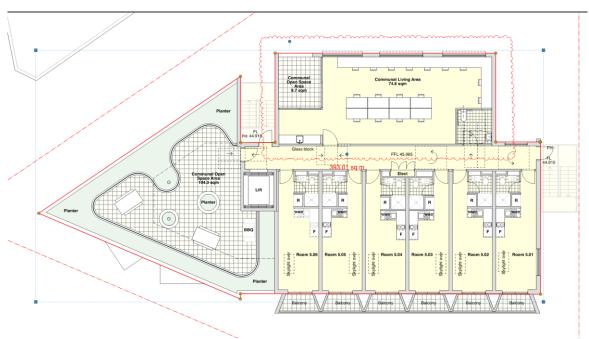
Fifth Floor - Total Floor Area (393.01m²)
